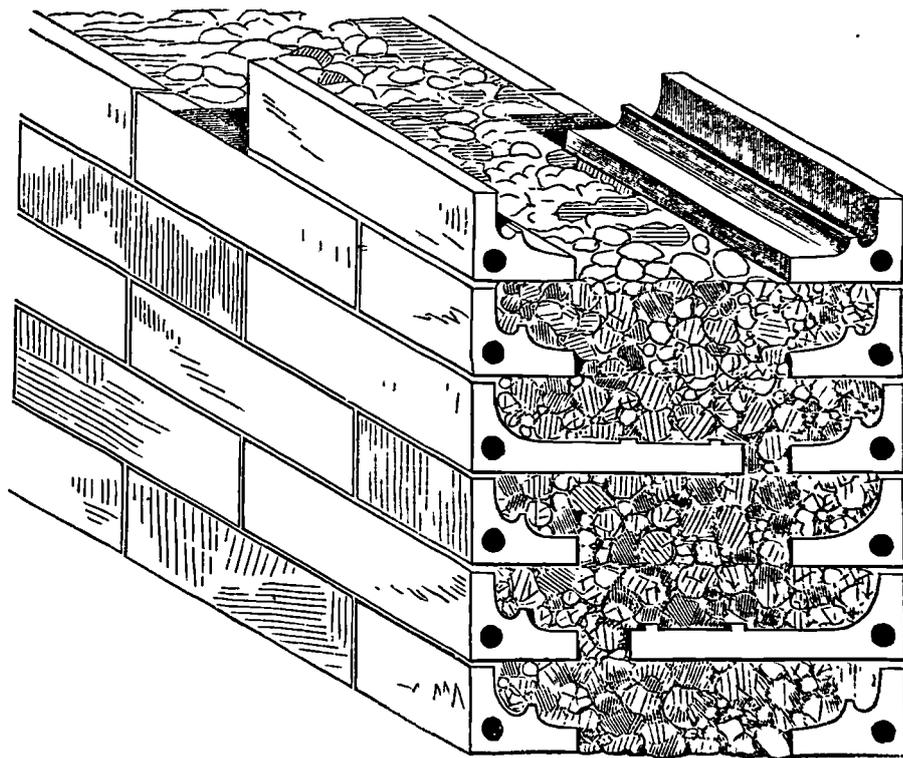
John Taylor's perforated facing bricks built into a concrete wall.
